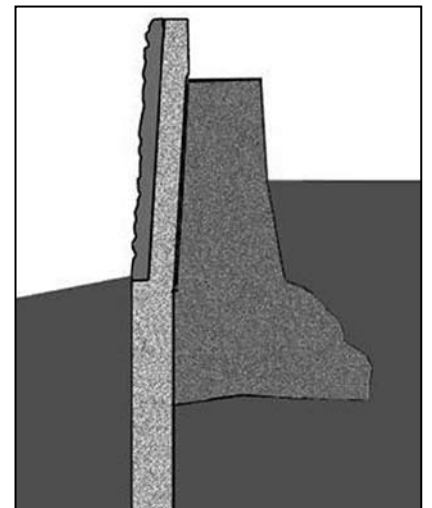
(above) Compromise solution for flood wall assimilated to the old city wall behind it, schematic section
